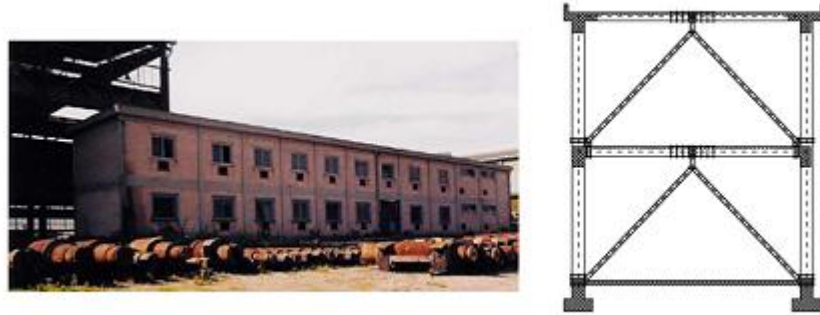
Photographic view of original building and typology of brace retrofitting method (Mazzolani, 2008)
